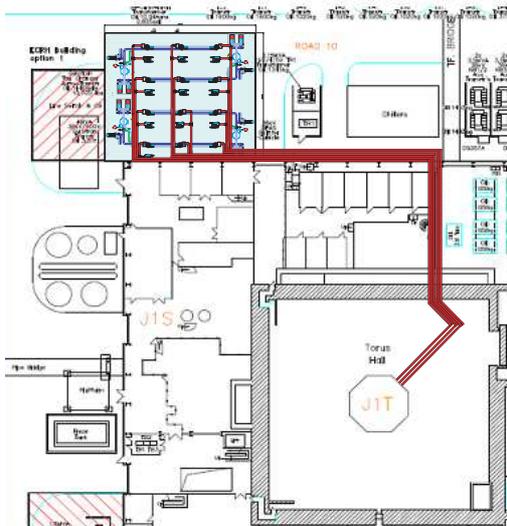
sketch of the plant layout and waveguide routing from the gyrotron building to the tokamak
